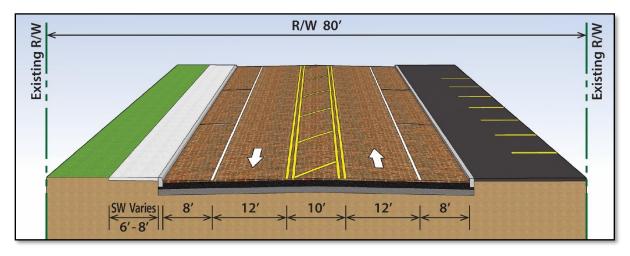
Existing Typical Section – Whiting Street – Selmon Expressway to Brush Street
